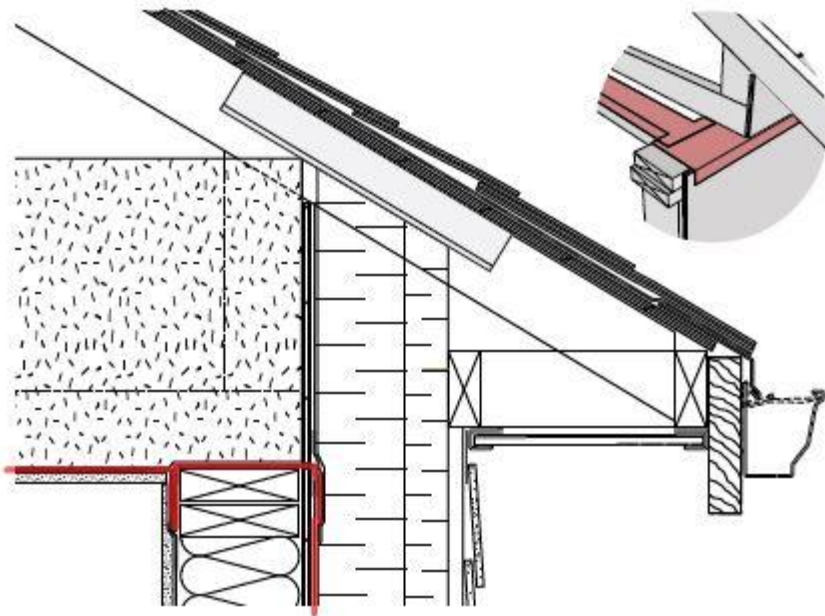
Roof-to-wall exterior air barrier redline detail (annotations not shown).
